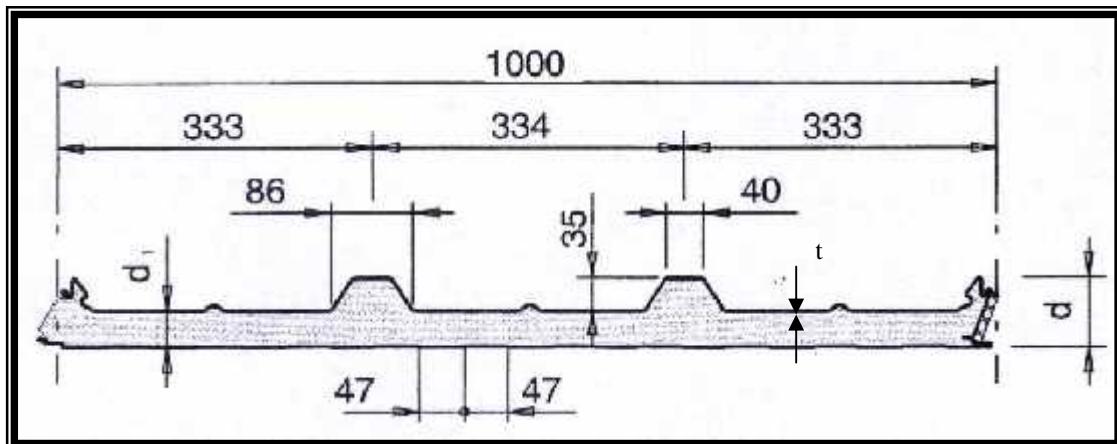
2): section of corrugated roofing sheets (CS.1).
